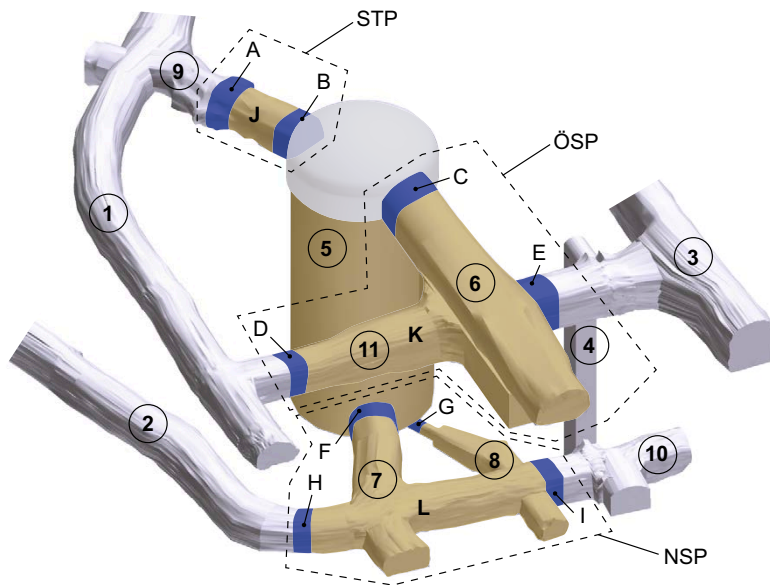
Illustration of closed silo with three plug sections (NSP, ÖSP and STP). Blue colour shows concrete plugs (A-I) and brown colour shows hydraulic tight sections (J, K, L). Key to numbering: 1) Construction tunnel, BT 2) Lower construction tunnel, NBT 3) Central tunnel, CT 4) Connecting shaft, 5) Silo, 6) Loading-in building, IB 7) Silo bottom tunnel, 8) Drainage tunnel, 9) Silo roof tunnel, 1STT, 10) Terminal part of lower construction tunnel, 11) Silo tunnel. Tunnel parts 1, 2, 3, 4 and 10 belong to the tunnel system.
